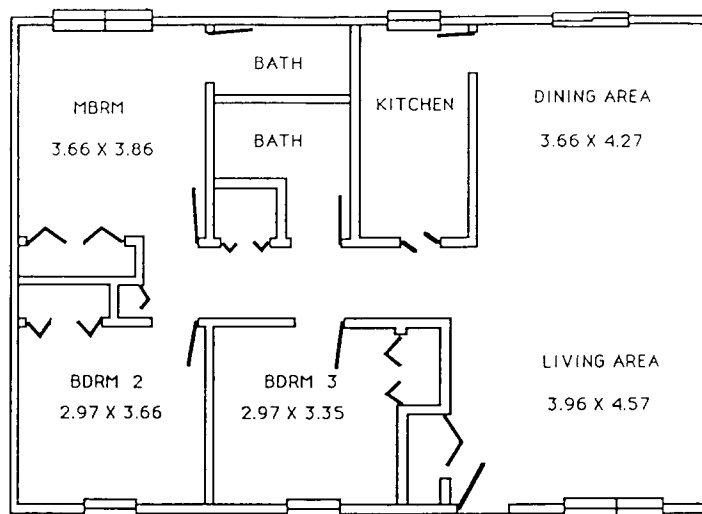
Floor plan of house specified in HAZARD I simulations. Dimensions in meters.
